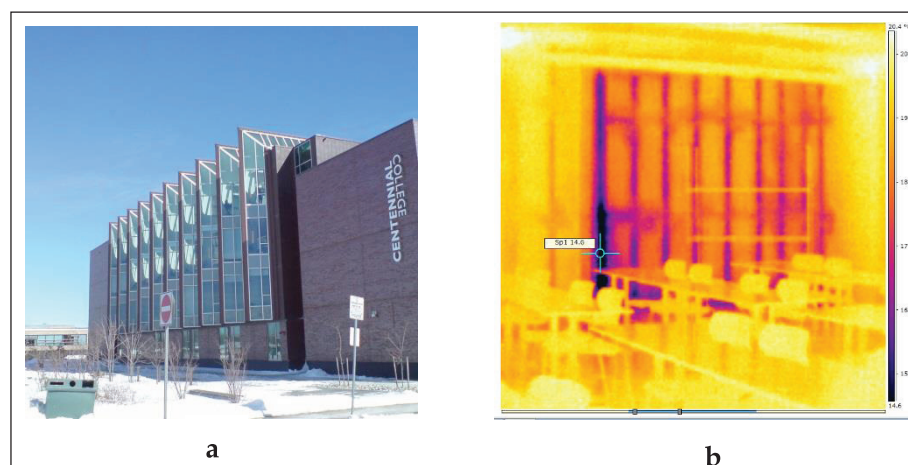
(a) Façade of the LEED building (Centennial Campus), composed of bricks and copper cladding (b) Thermal imaging showing thermal bridging through the steel studs (by the author).
